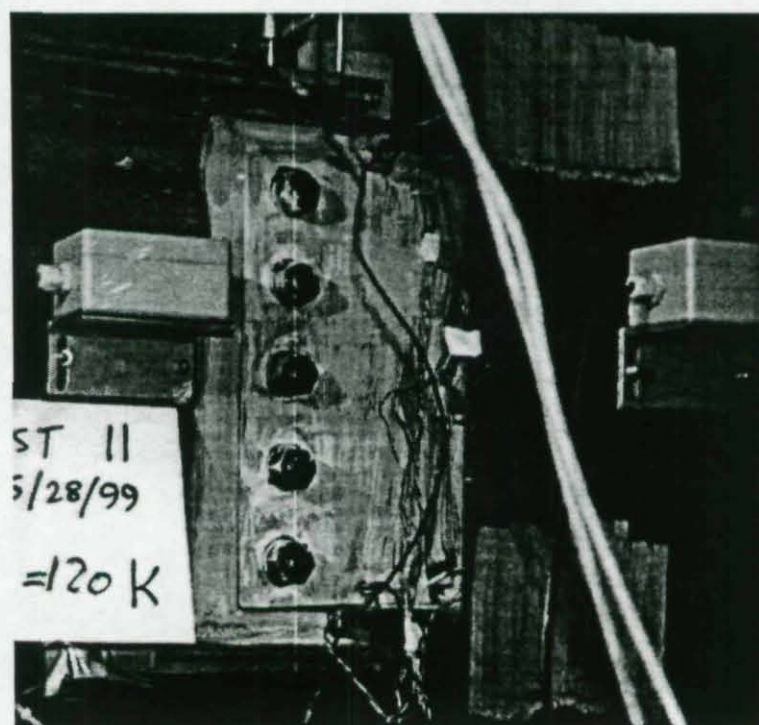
Typical whitewash coating of connection and support flanges (Test 4-B)
